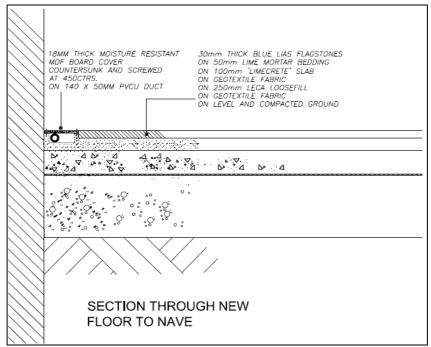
Proposed foundation specifications for new flooring in the nave and north aisle.
